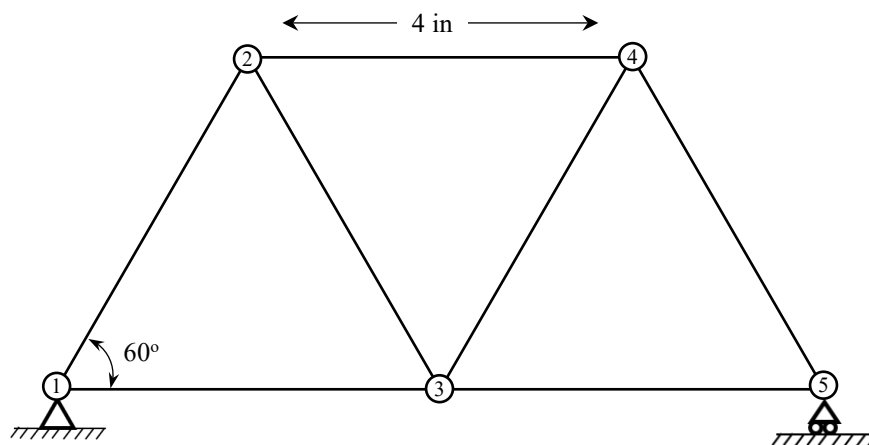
Warren truss bridge. Three equilateral triangles elements
